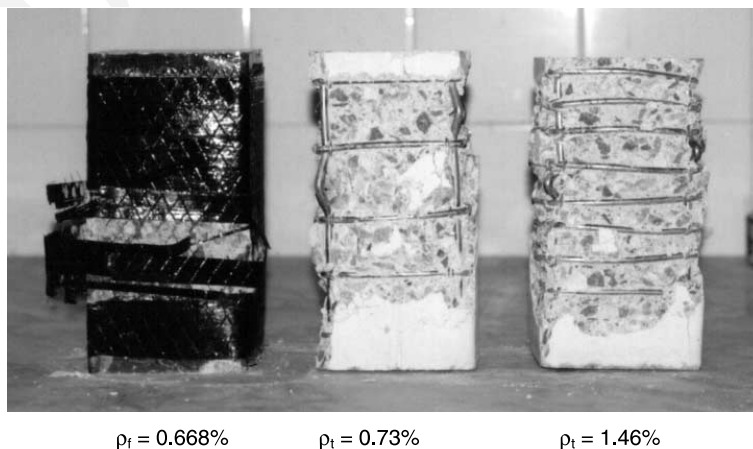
Mode of failure of concrete specimens reinforced with transverse steel reinforcement and FRP [13].
